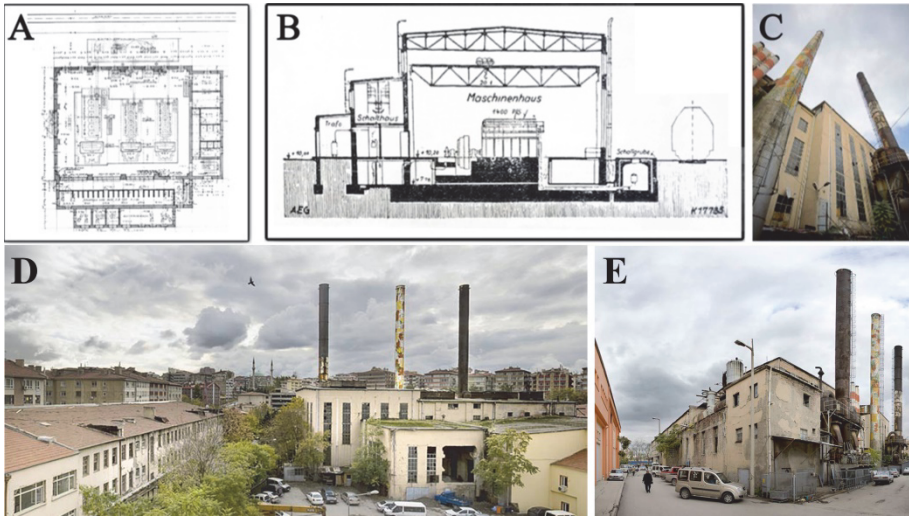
(A) Ankara Power Plant Plan, (B) Ankara Power Plant Steel Roof Truss System, (C), (D), (E) Ankara Power Plant (BCA 230-0-0-0/5/17/1, URL 2)
